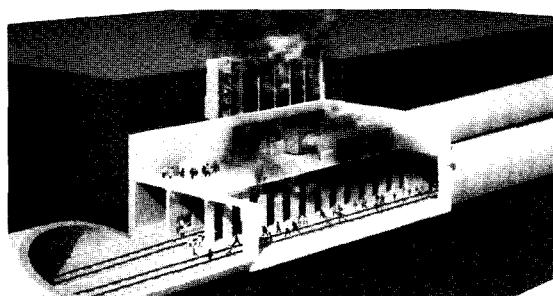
A perspective drawing showing that smoke is contaminating egress stairs in extract air towers
